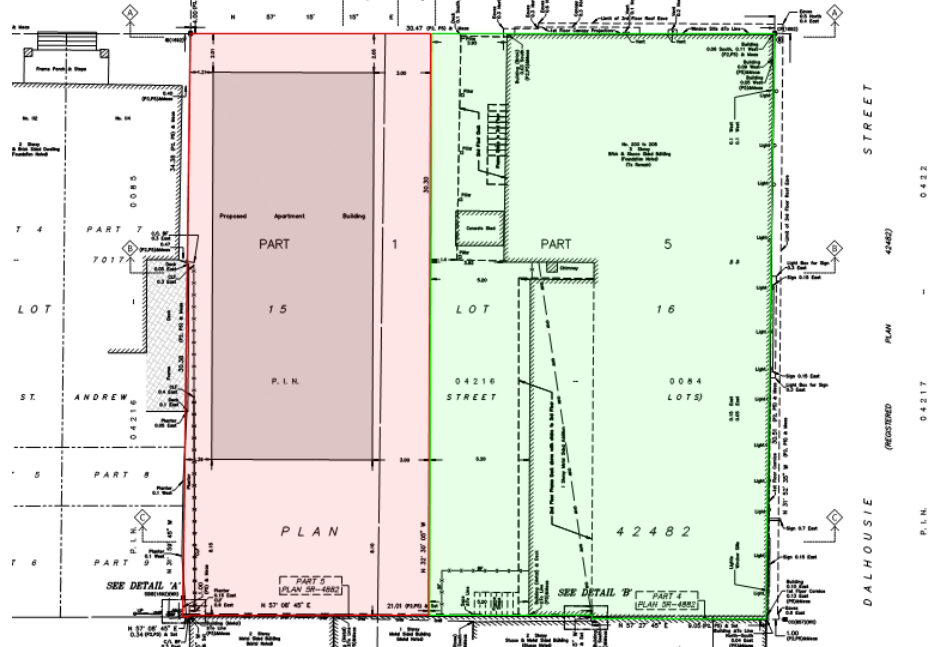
Consent Applications, Elevation 44.00 to 58.00 (no easements proposed at this elevation)
